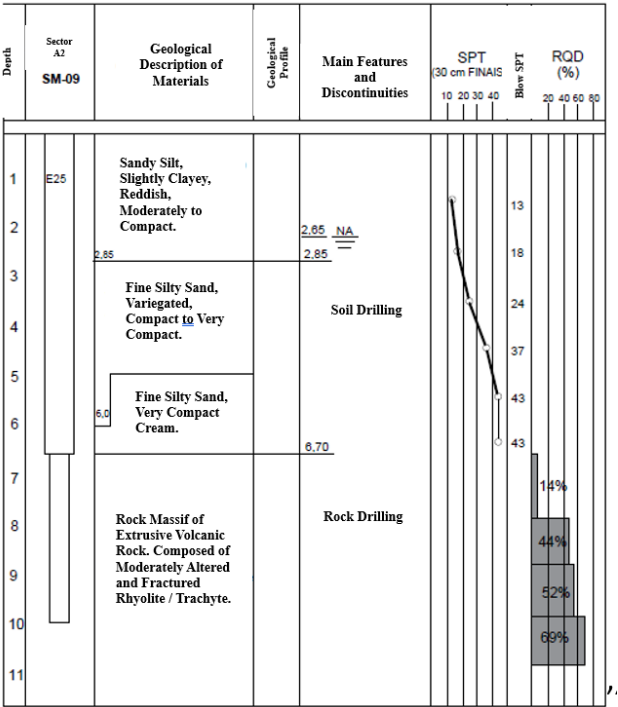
Geotechnical profile of the execution point of pile E25 in sector A2.
